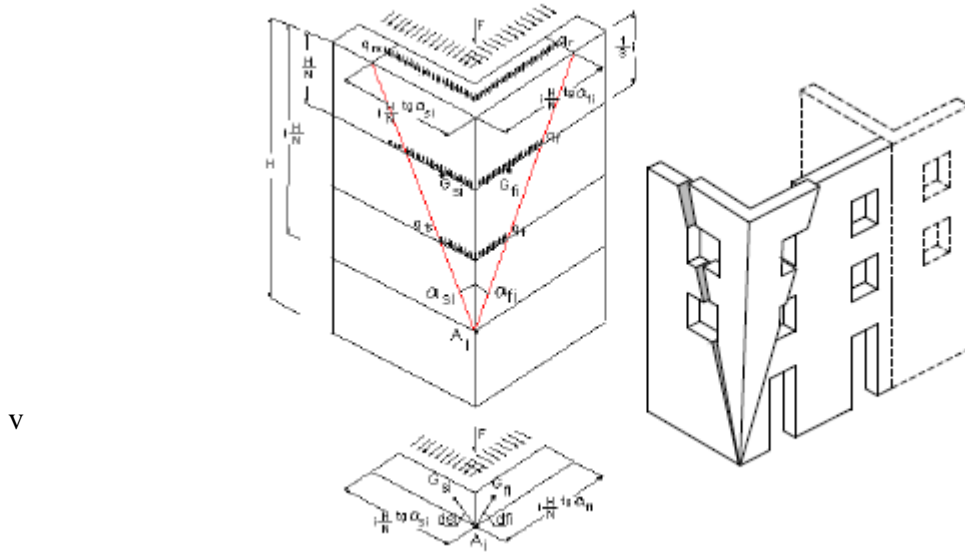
One free corner in an isolated building or end/corner building in a row/group
